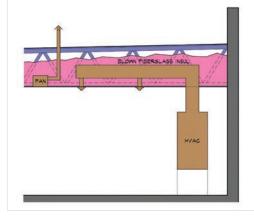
This cross-section of a cold roof deck shows HVAC, bath and clothes dryer ducts that pass through this space. Their position negates the vapor retarder for any air that will leak from these ducts.
